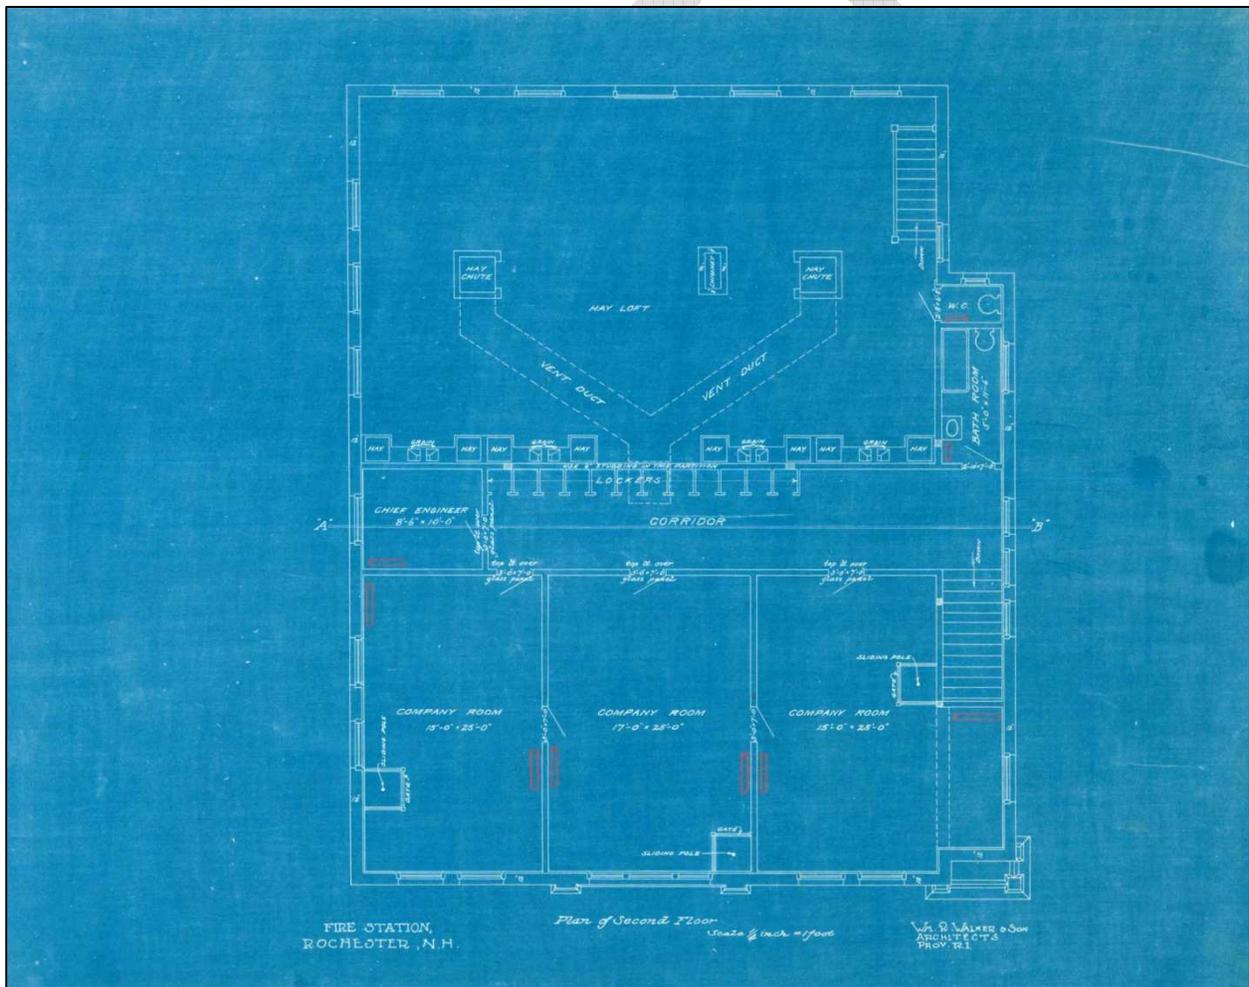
Walker & Sons plan of 2nd Floor, 1903.
